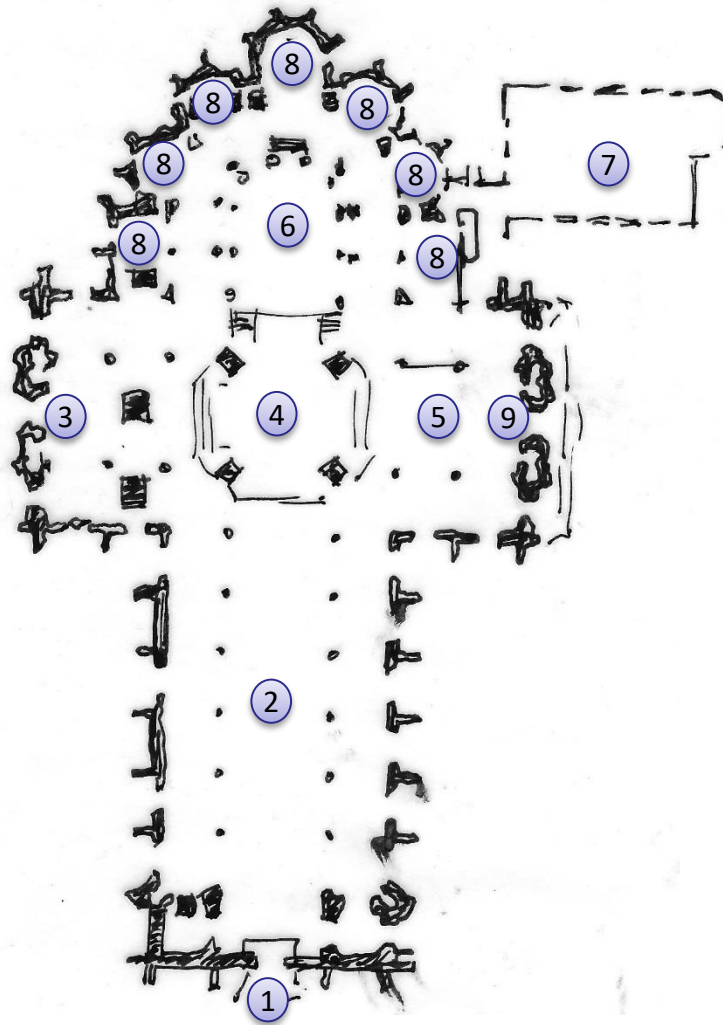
St. Patrick's Cathedral floor plan, Australia, Sketch Floor Plan (Author 2021).
